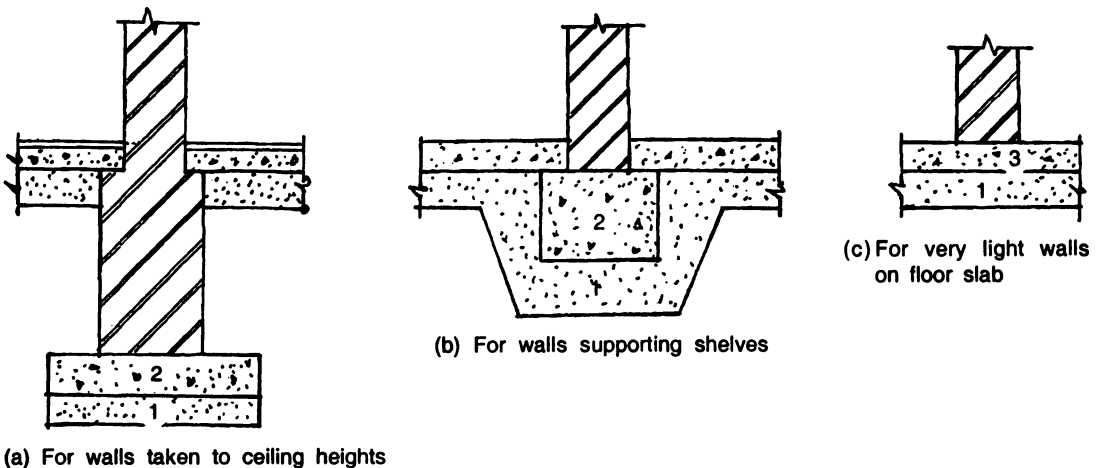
Foundations for lightly loaded half-brick walls or good soil: 1. Sandfilling, 2. Foundation concrete, 3. Floor slab.
